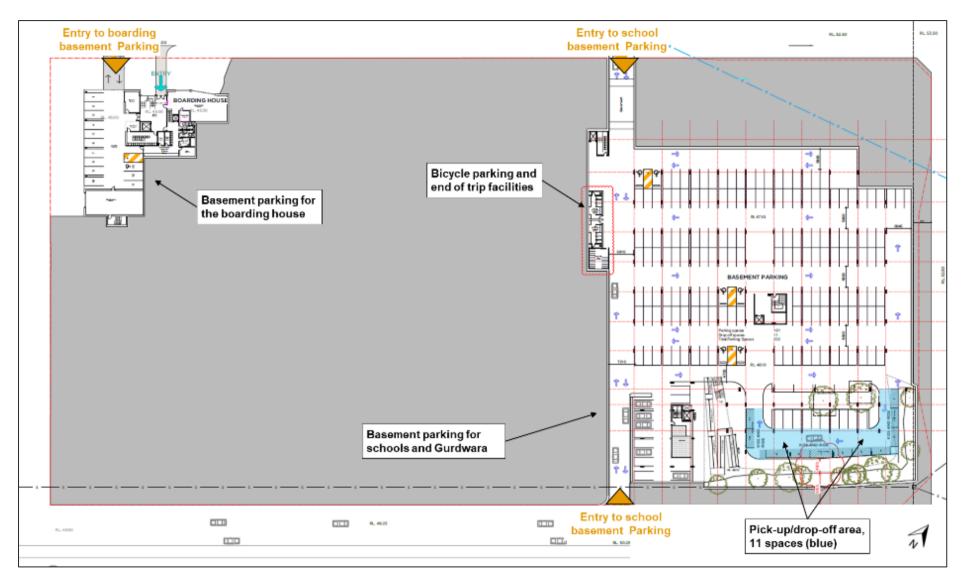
| Basement parking plan showing school, Gurdwara and boarding accommodation parking (Source: Applicant's RtS 2020)
